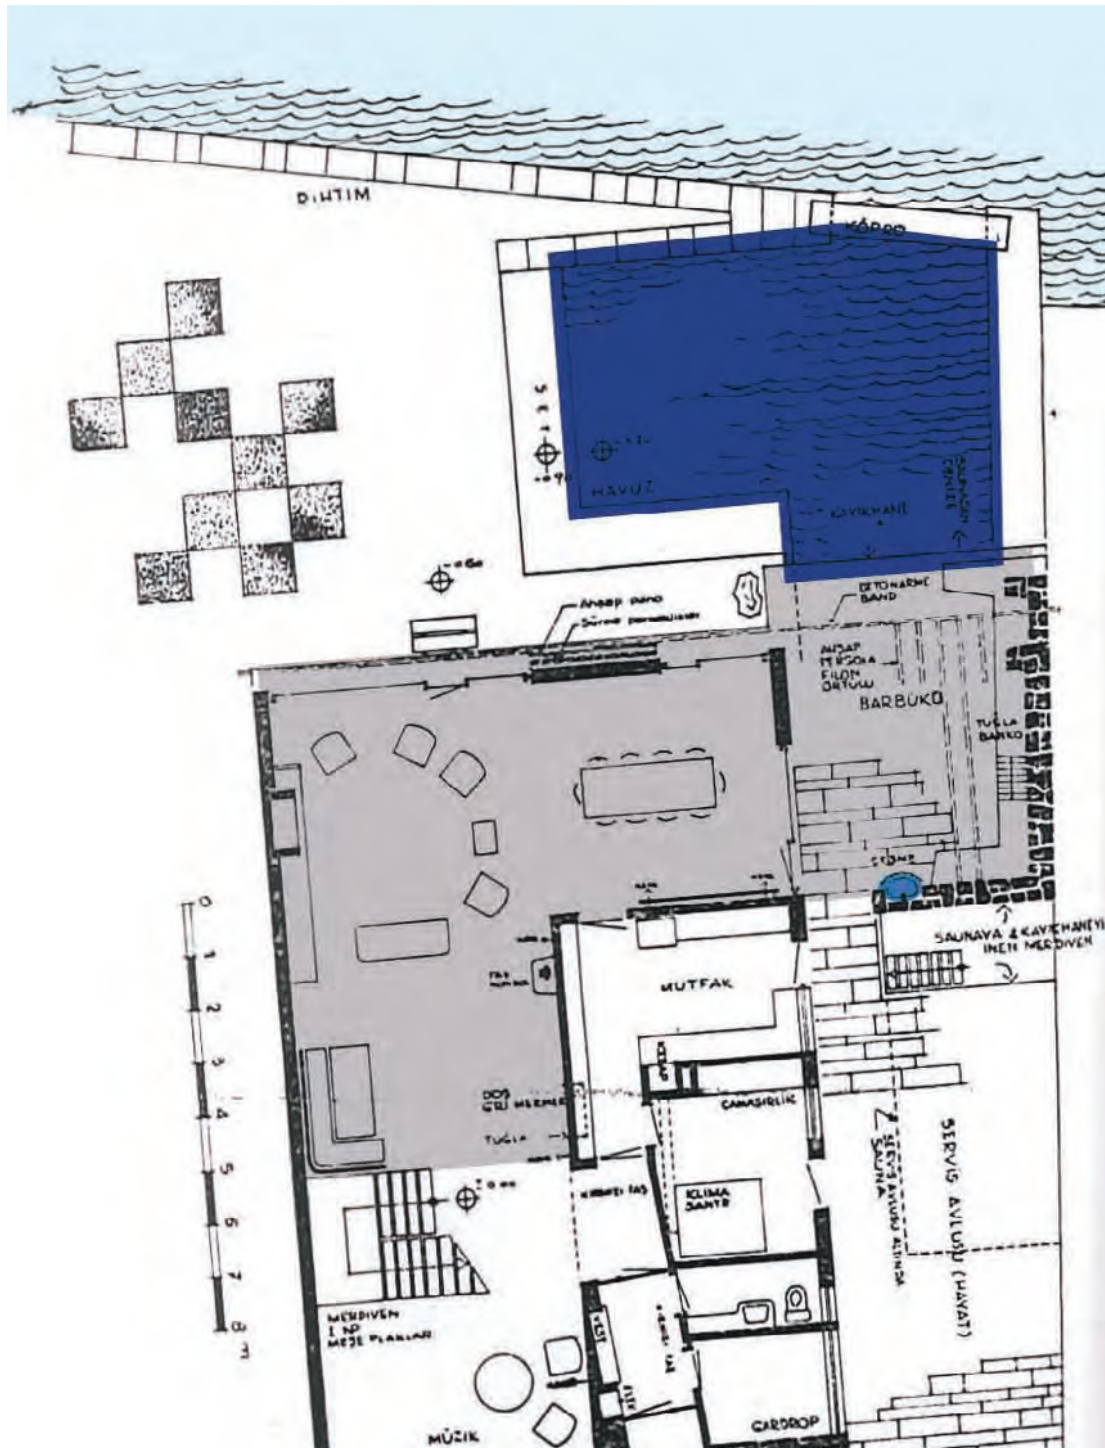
Plan of Barlas *Yalı* in Istanbul-Yeniköy (United Architects)
